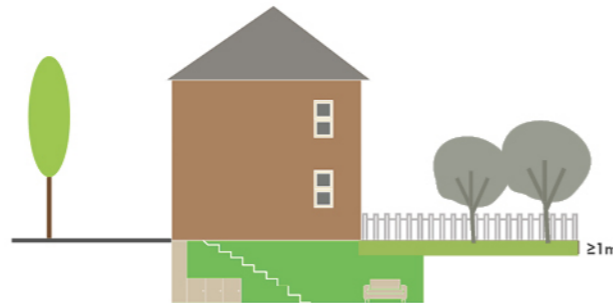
Reinstatement of garden soil to at least 1m depth to support sustainable drainage and planting
